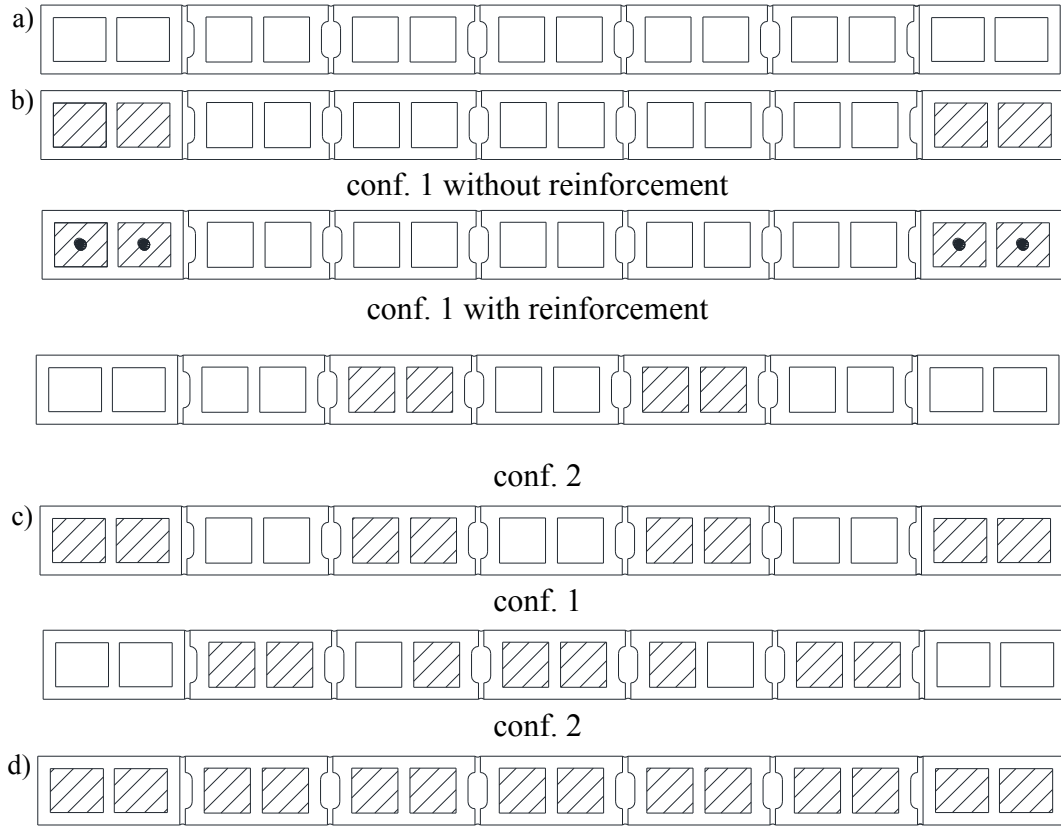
Extent and configuration of grouting: a) 0% grouting, b) 30% grouting (configuration 1: loaded corner column grouted without and with reinforcement; configuration 2: loaded corner column ungrouted), c) 50% grouting (Configuration 1 and 2), d) full grouting
